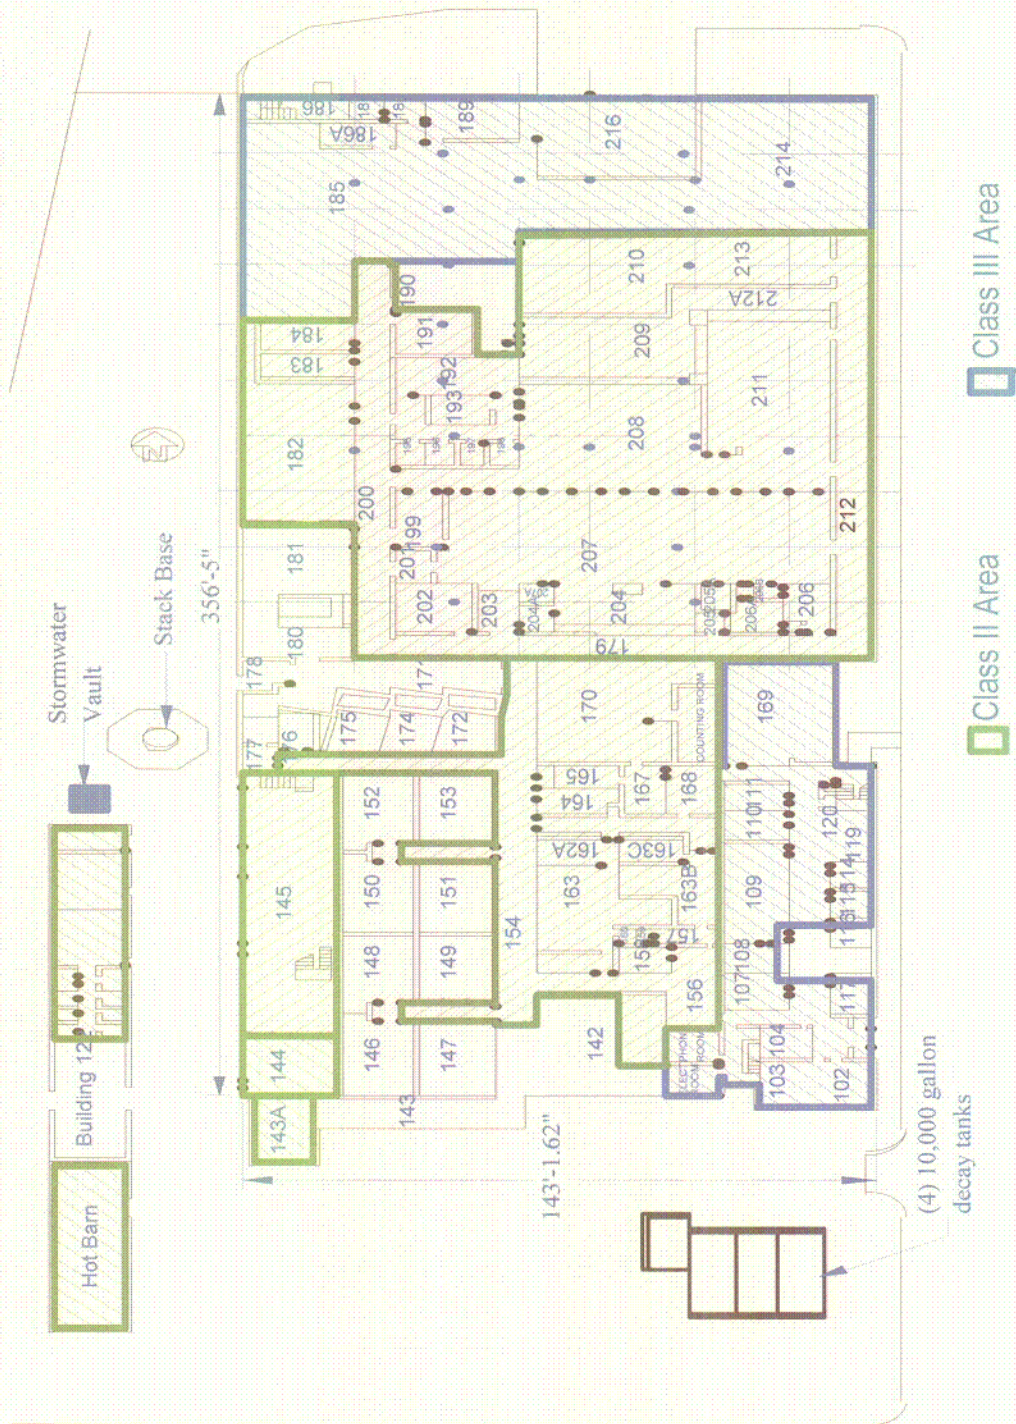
BMS Building 124 First Floor Structure Class 2 and Class 3 Areas
